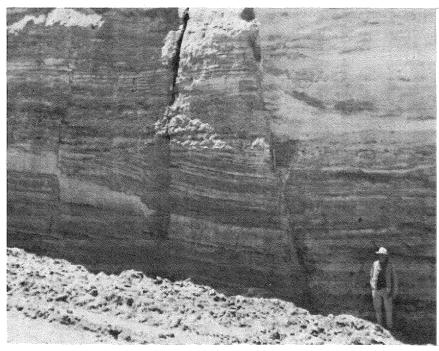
South face of an excavation into zone of Fault 1 near gate tower site, April 29, 1948. Total offset across the four faults shown estimated in excess of 30 feet.
